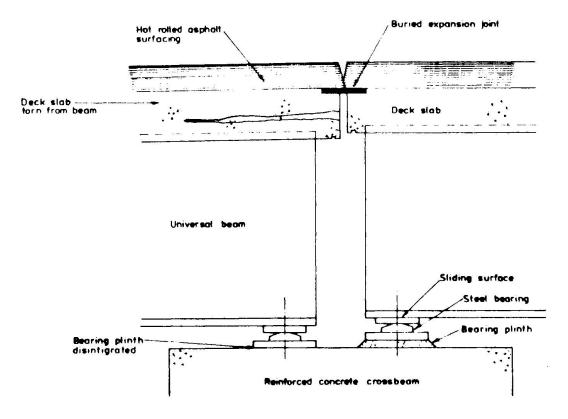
Midland Links Viaduct - Detail of Bridge Bearings
